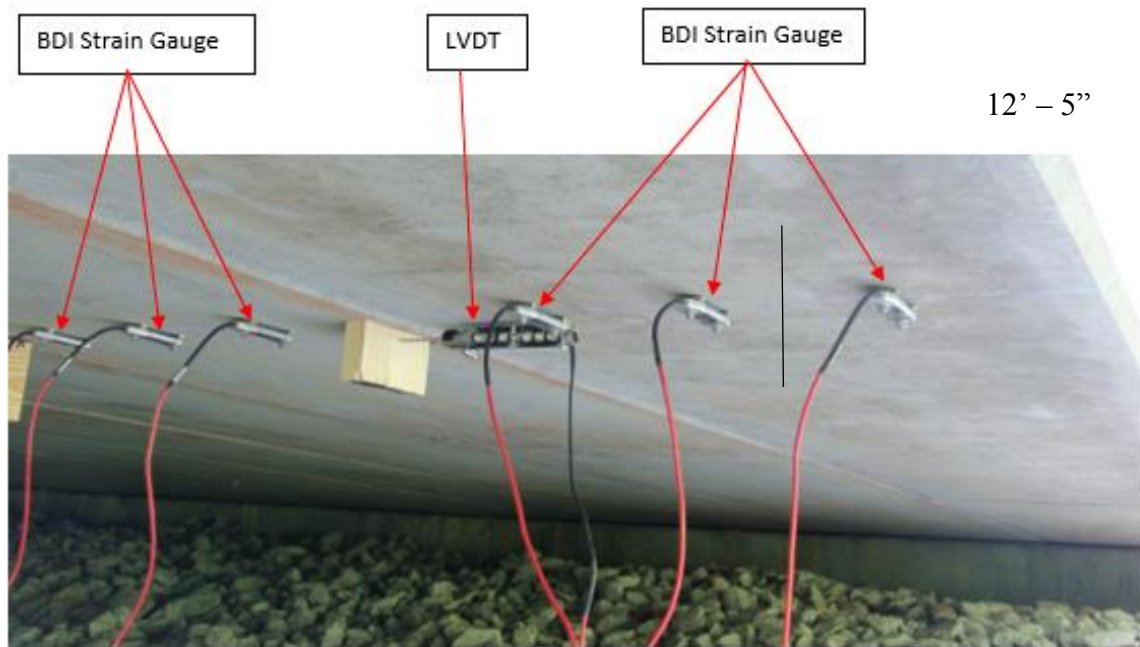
Strain Transducers and LVDT Rigged on Solid Slab Span
